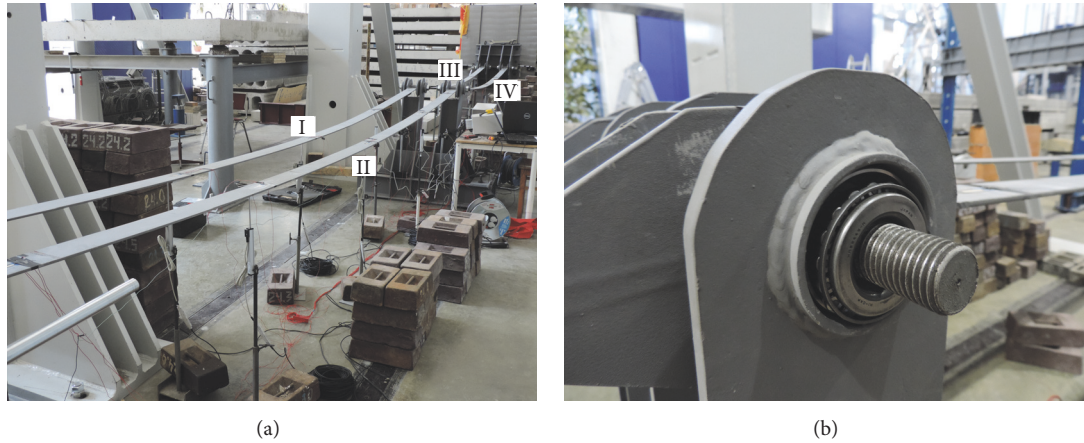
Steel bands (numbered items) of the bridge model (a) and ribbon anchorage joint (b).
